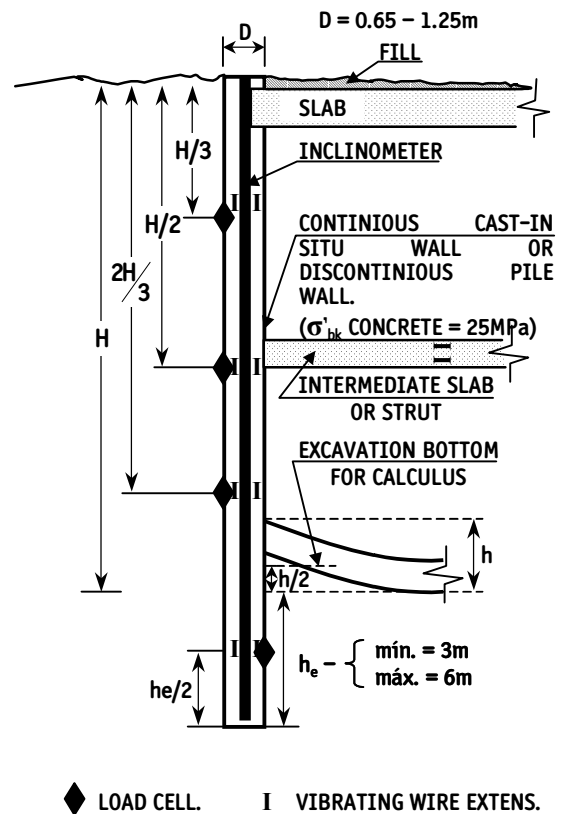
Instrumentation In The Wall For Stations And Line Tunnel
